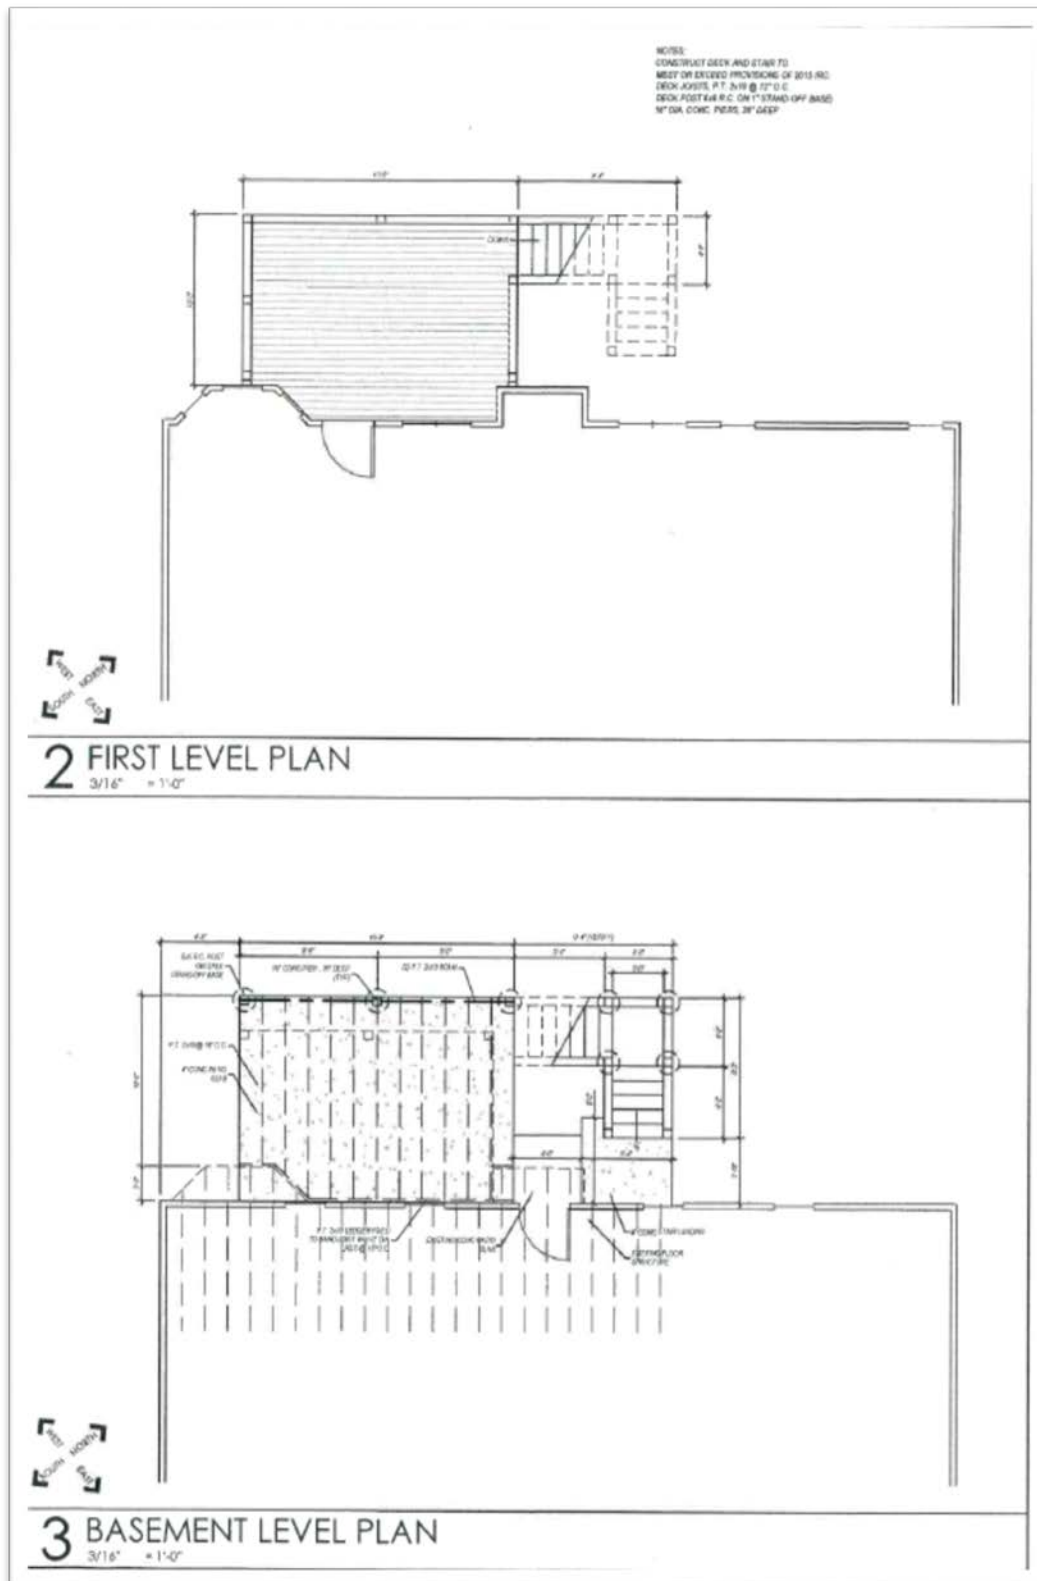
Plans showing measurements of the existing and proposed decks. The existing deck allows for a 20 foot, three inch rear yard while the proposed deck allows for an 18 foot, three inch rear yard.
